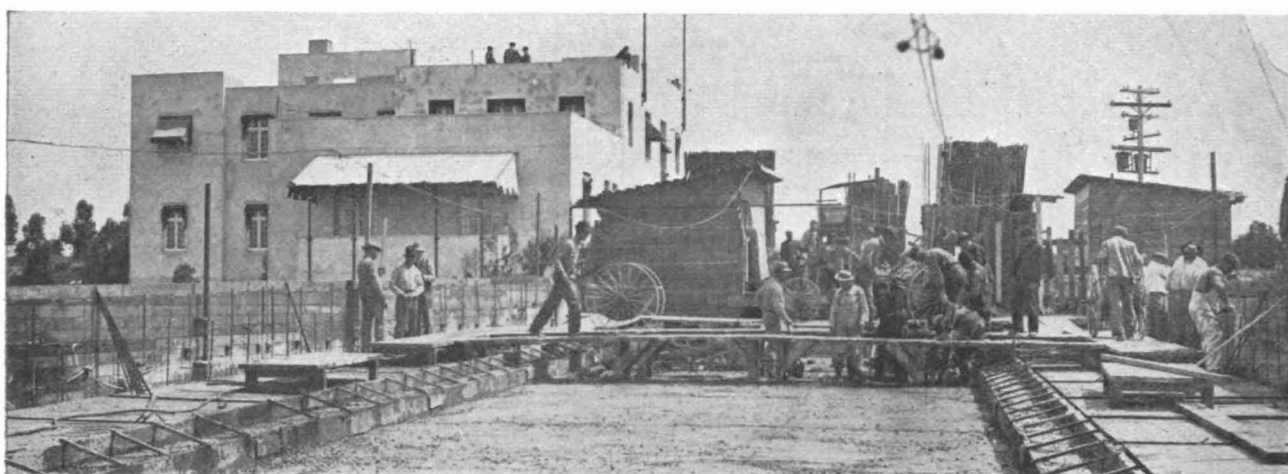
RUNNING THE BRIDGE FLOOR ON THE SAN DIEGO WORK
